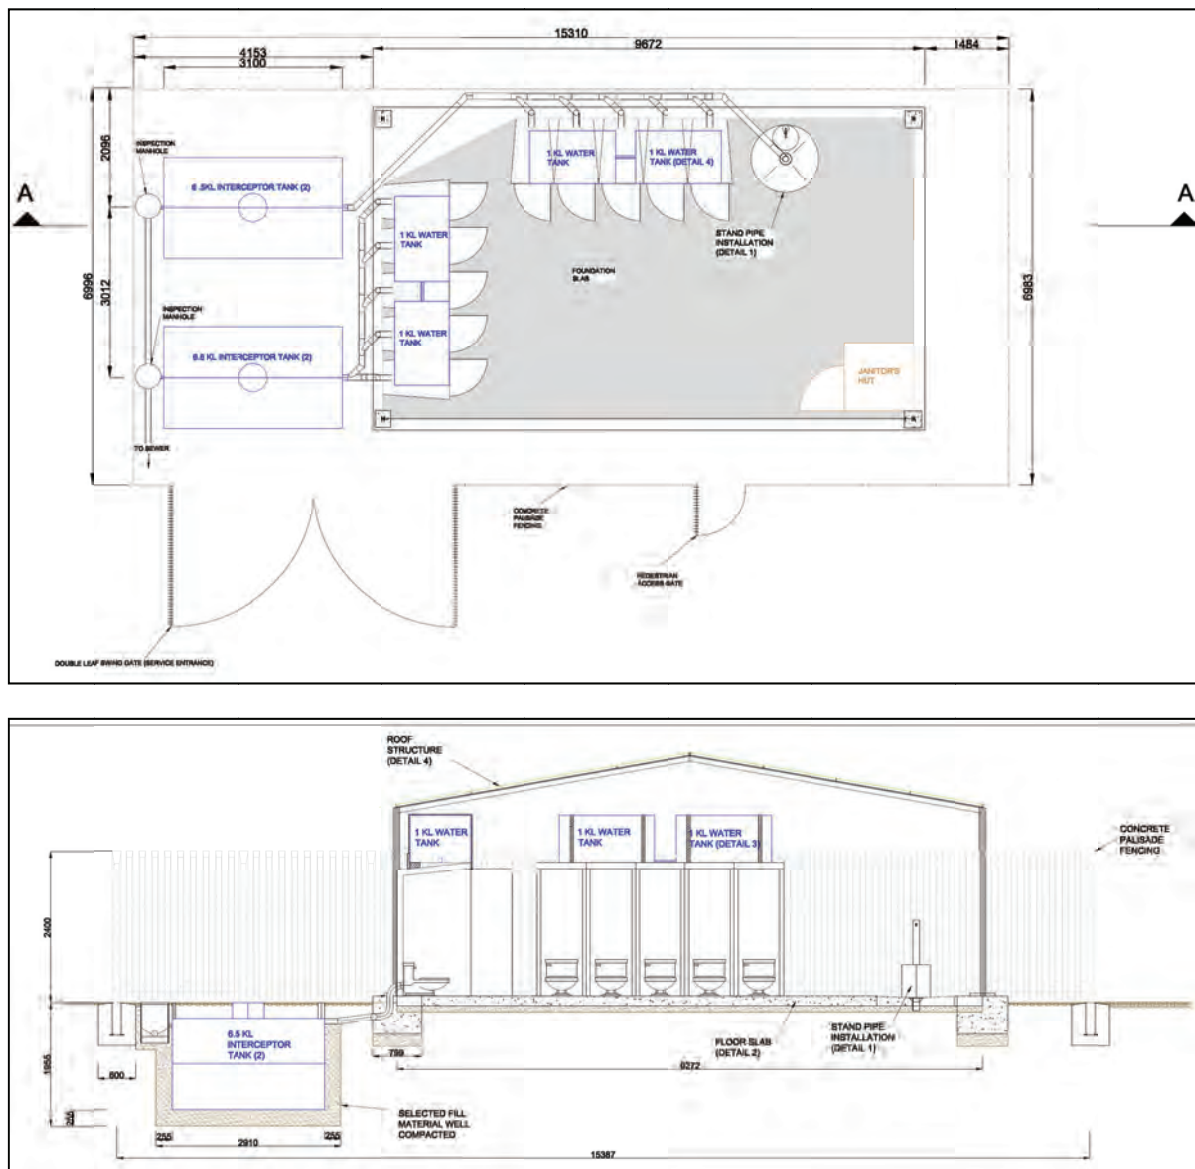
Proposed layout for site E: plan view (top) and elevation (bottom).
